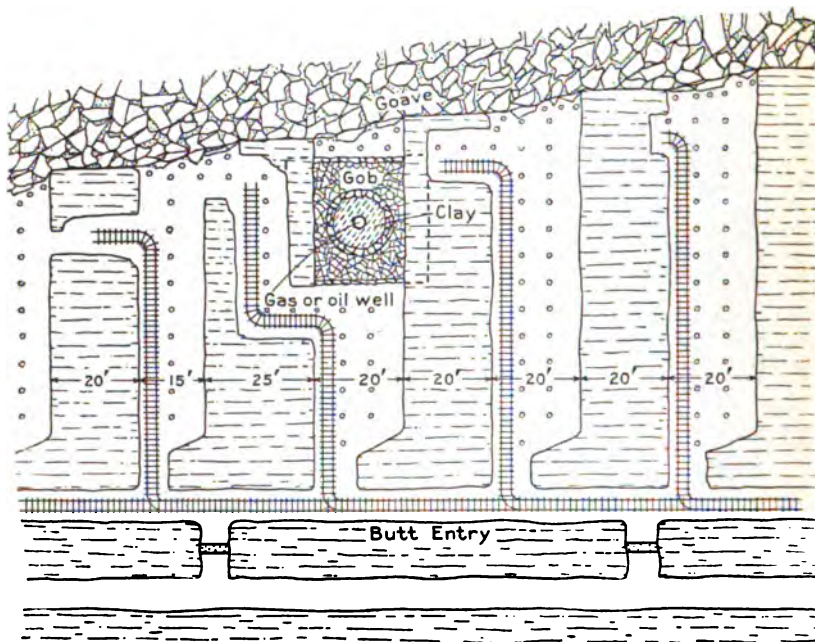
Proposed method of protecting well where coal pillar has been removed. Plan.
